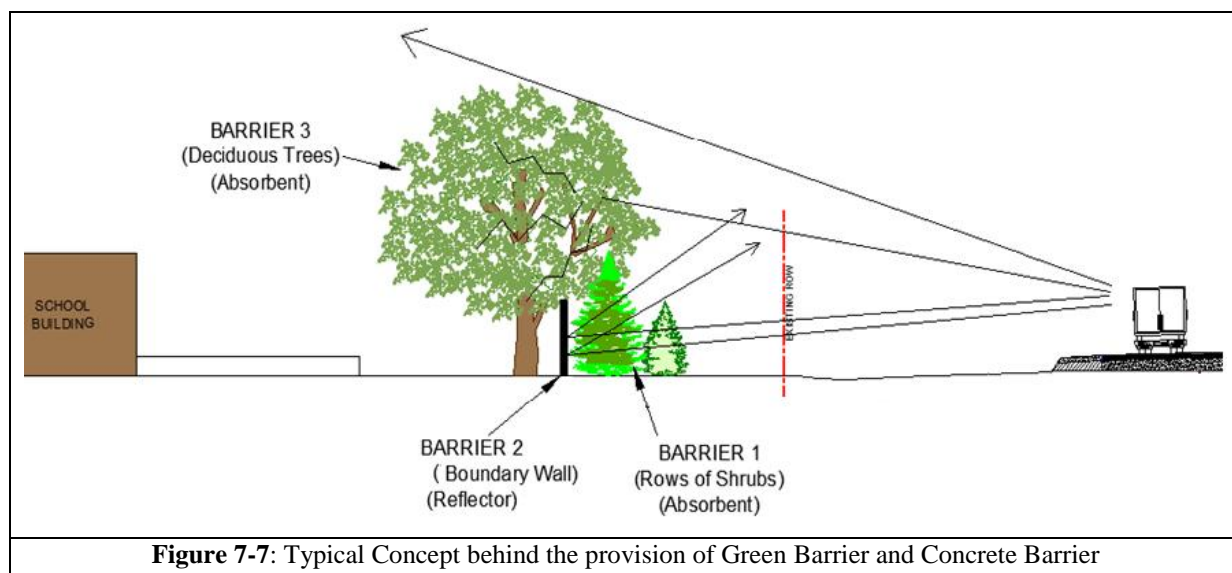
Typical Concept behind the provision of Green Barrier and Concrete Barrier
